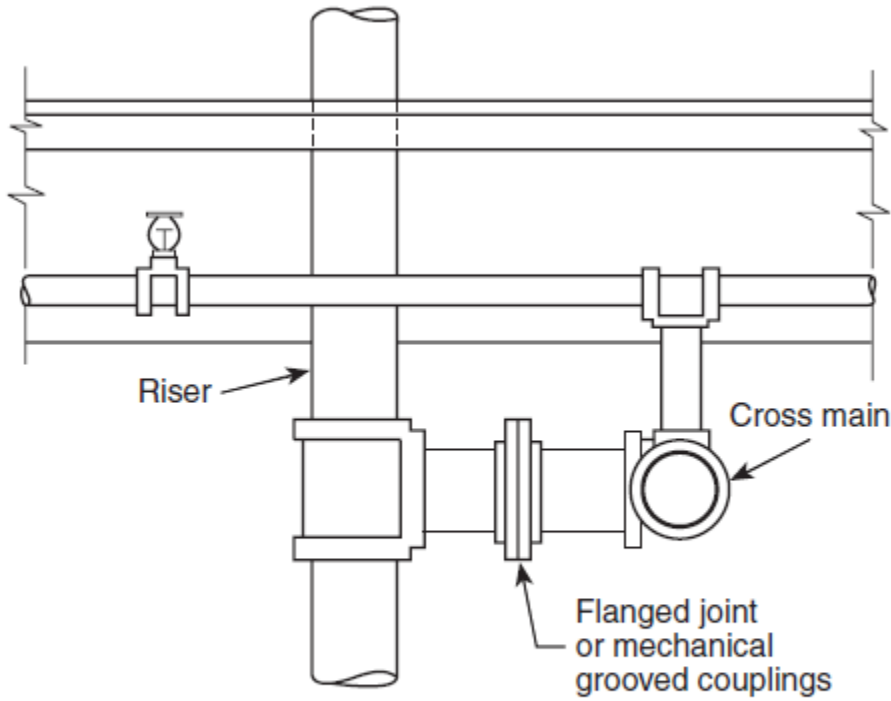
One Arrangement of Flanged Joint at Sprinkler Riser.
